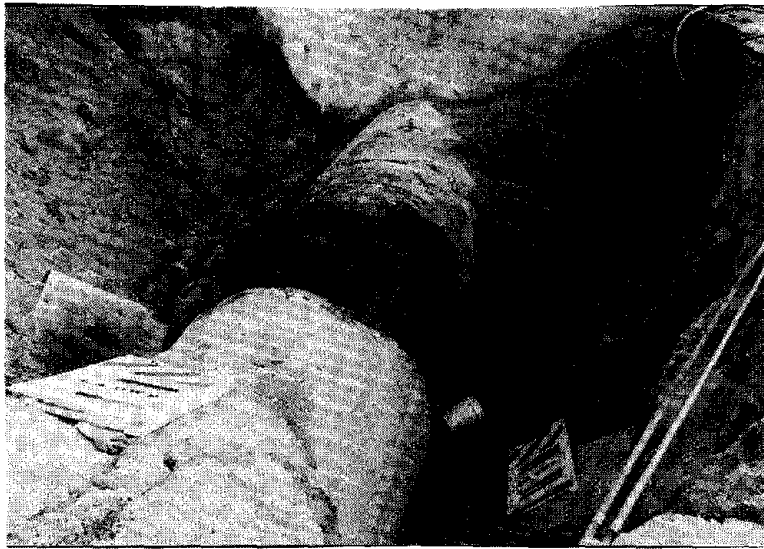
Damage of a Expansion Joint Water of a Pipe near a Tank on a Hill (Aqueducts Plant, DWP, City of Los Angeles)
